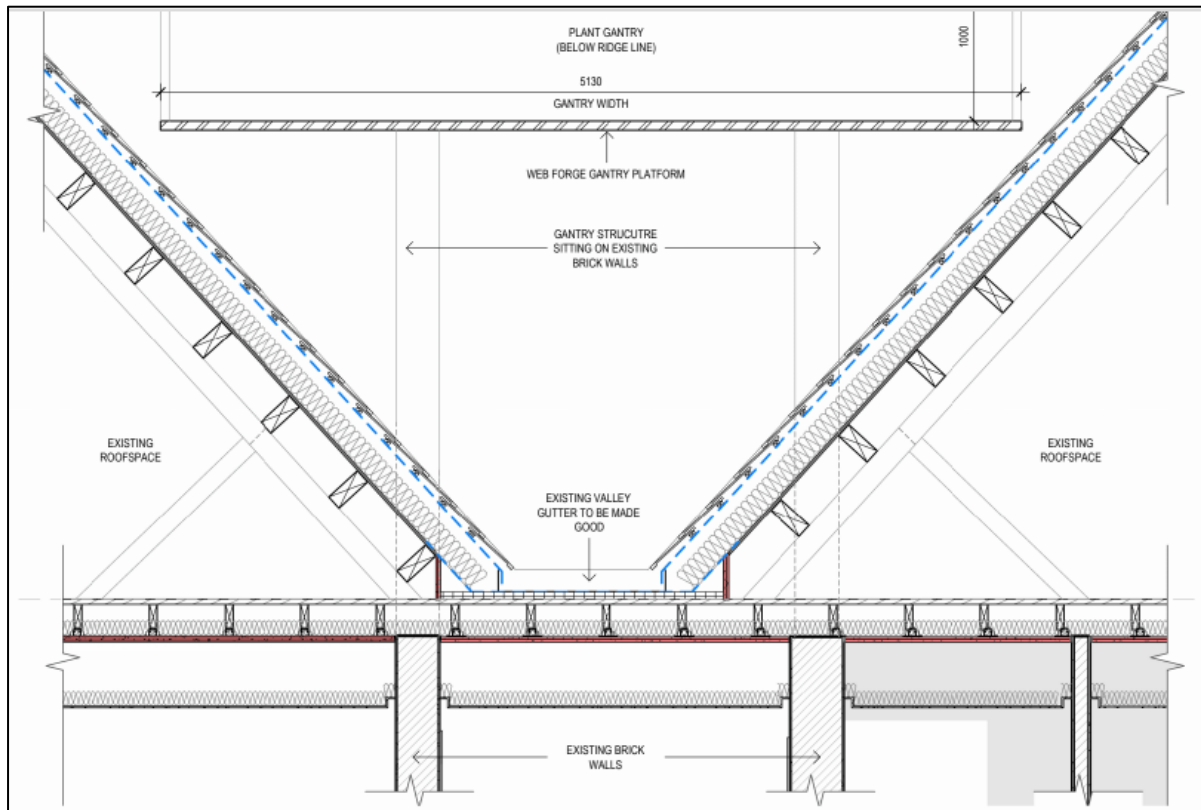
Section through steel services gantry fixed to existing load-bearing brick walls.
